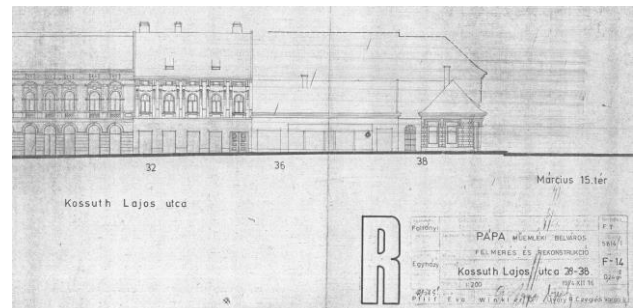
Downtown Reconstruction Plan, Detail (1974-1975) Street elevation proposal
